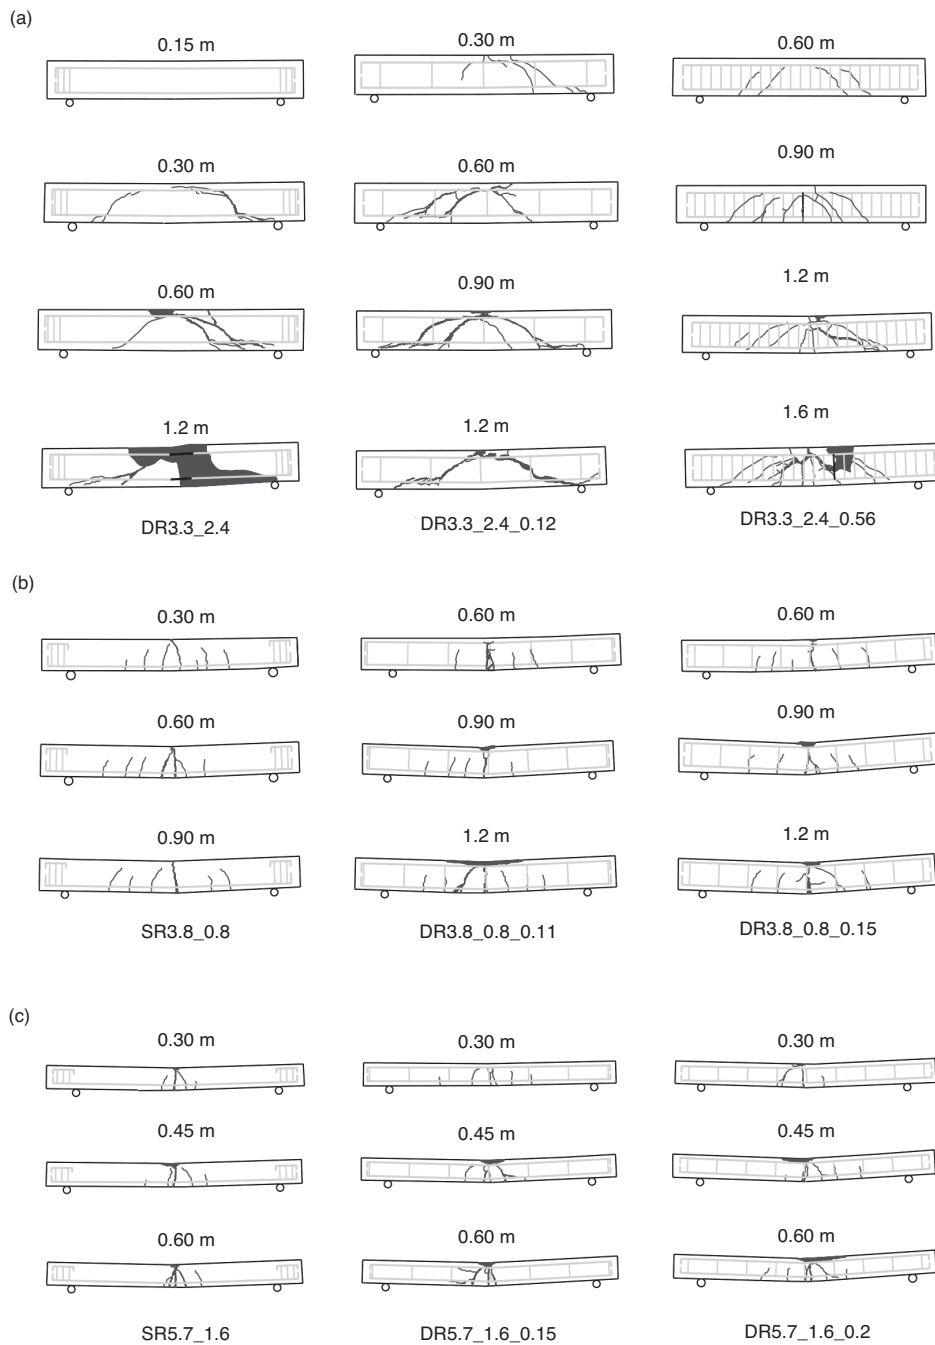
Crack pattern of beams (a) 3.3 series; (b) 3.8 series; (c) 5.7 series
